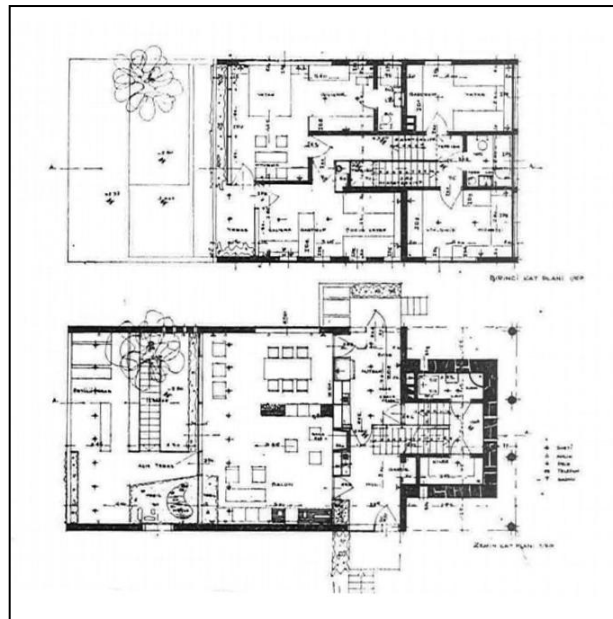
Floor plans of G. Şevket Saatçioğlu villas [84]
